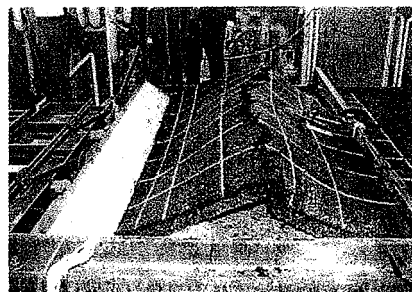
Final Configuration of the Model (Asphalt Paved ; With Anchor Dowel ; Static)
